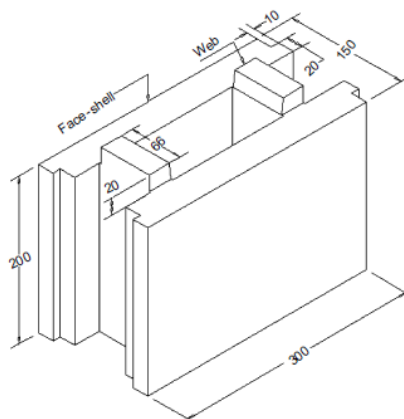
Dimensions of the dry-stacked masonry blocks [106]
